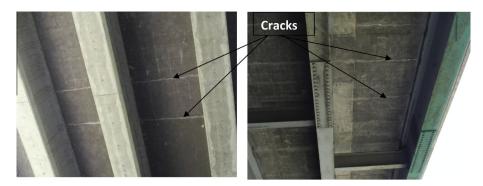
Transverse cracking in concrete (left) and steel girder bridges (right).
